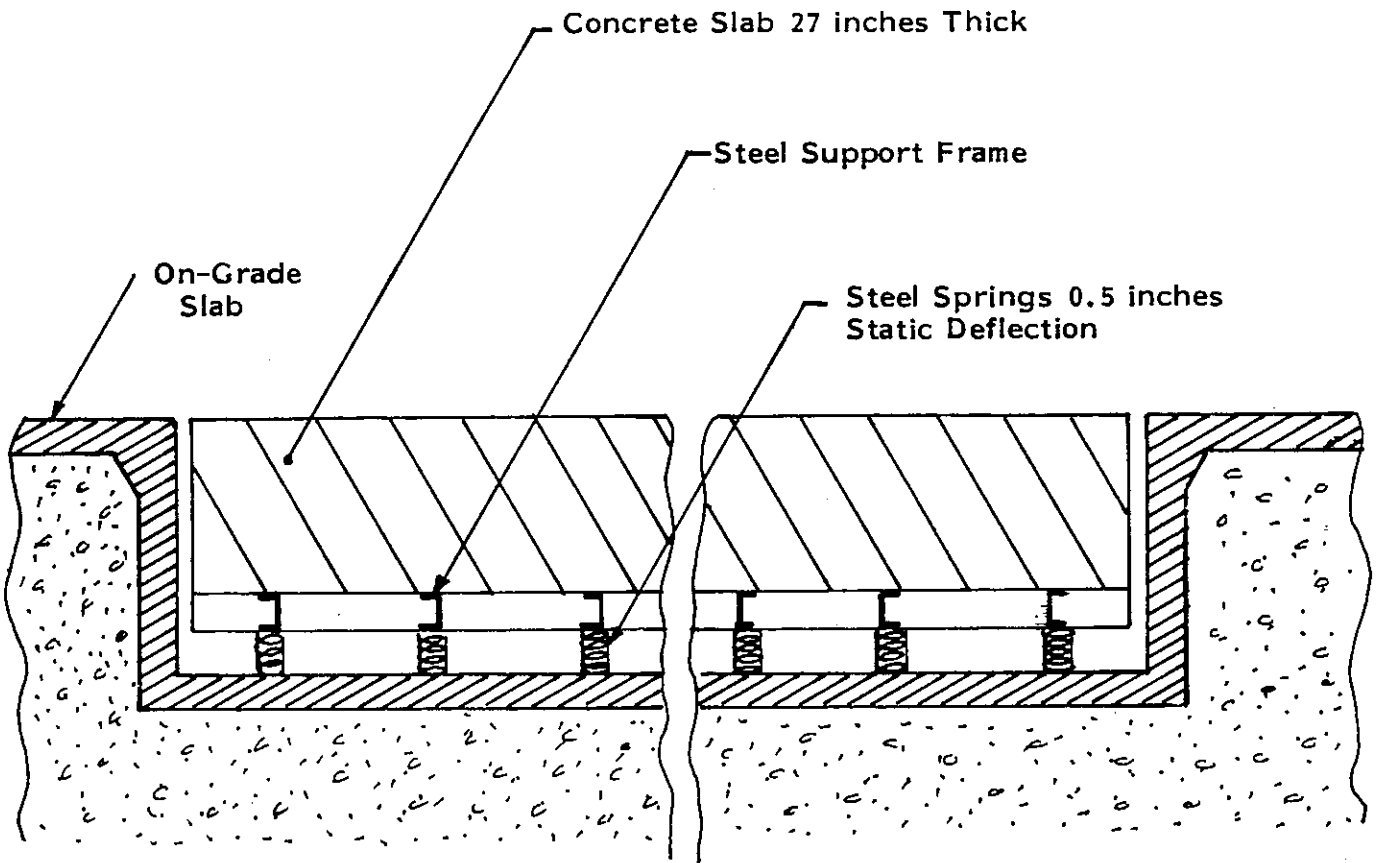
SECTION THROUGH VIBRATION ISOLATED CONCRETE SLAB
